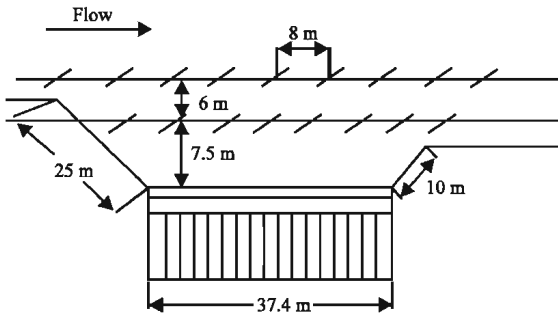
The two rows layout of the vanes (test 6) in the front of intake (internal layout)
